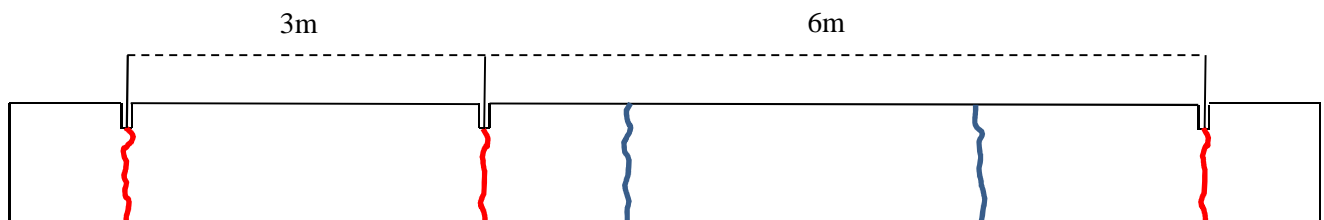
The crack pattern of a 6 m joint spacing slab containing 5 kg/m³ fibres
